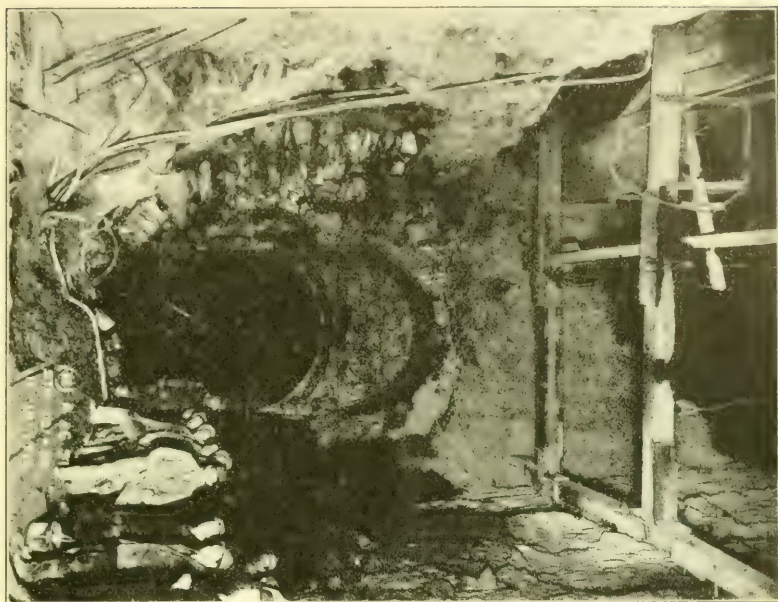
EXCAVATION FOR ELEVATOR SHAFT, LOOKING WEST.
